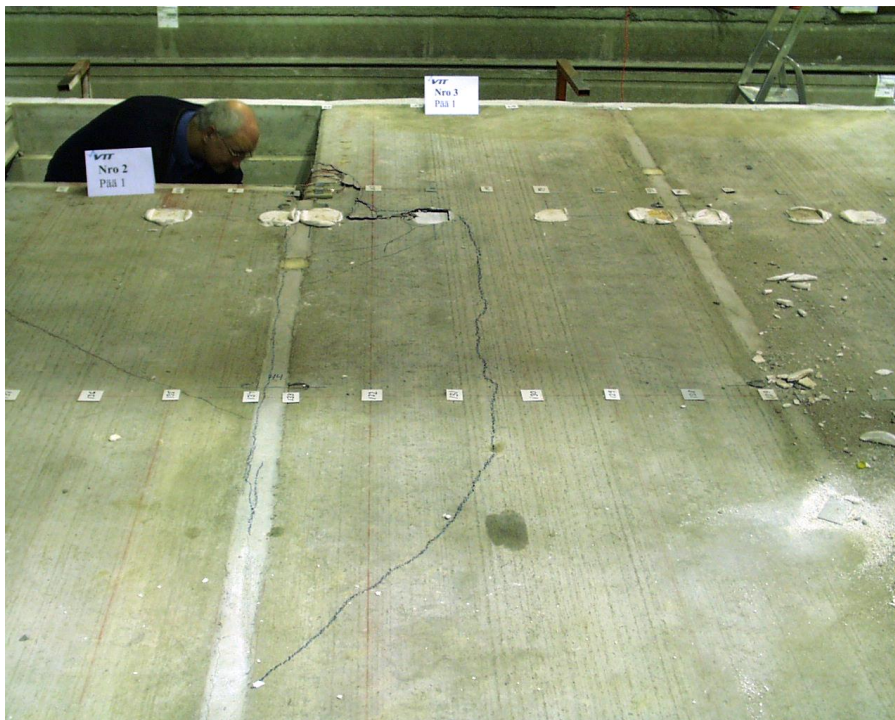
FT200:12. Cracks on top surface of slab 1 after failure.
